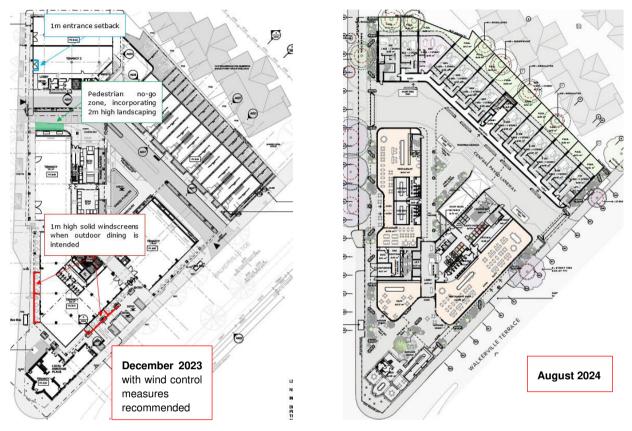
Comparison between the Ground floor plan used for wind tunnel testing (December 2023) and the updated Ground floor plan (August 2024).
